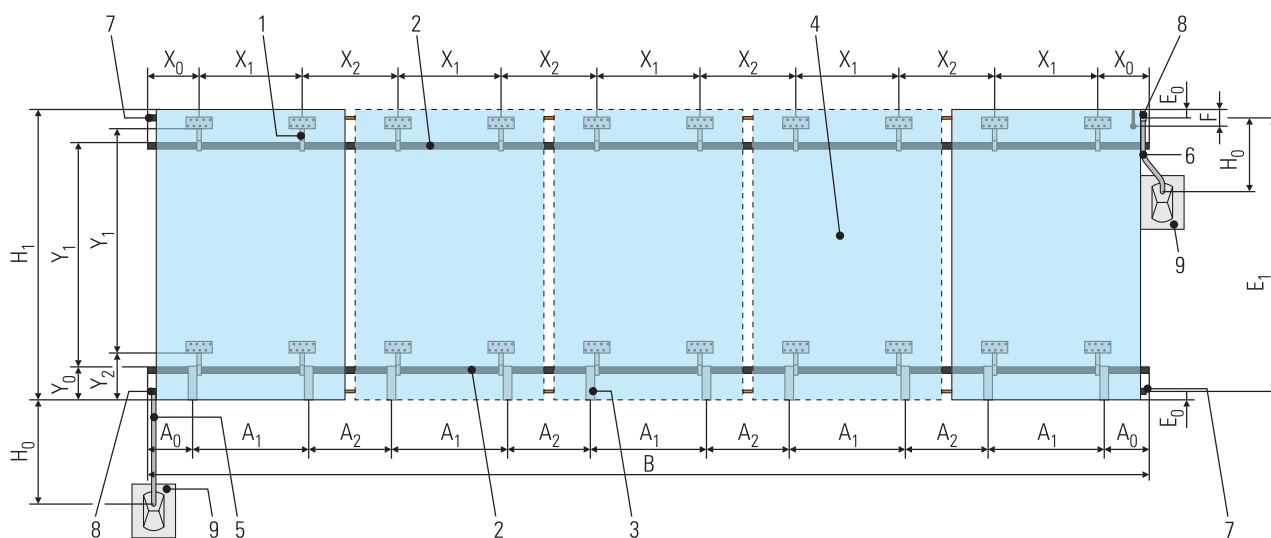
Main dimensions of a solar panel array for on-roof mounting (example shows solar panel EKSV26P)
